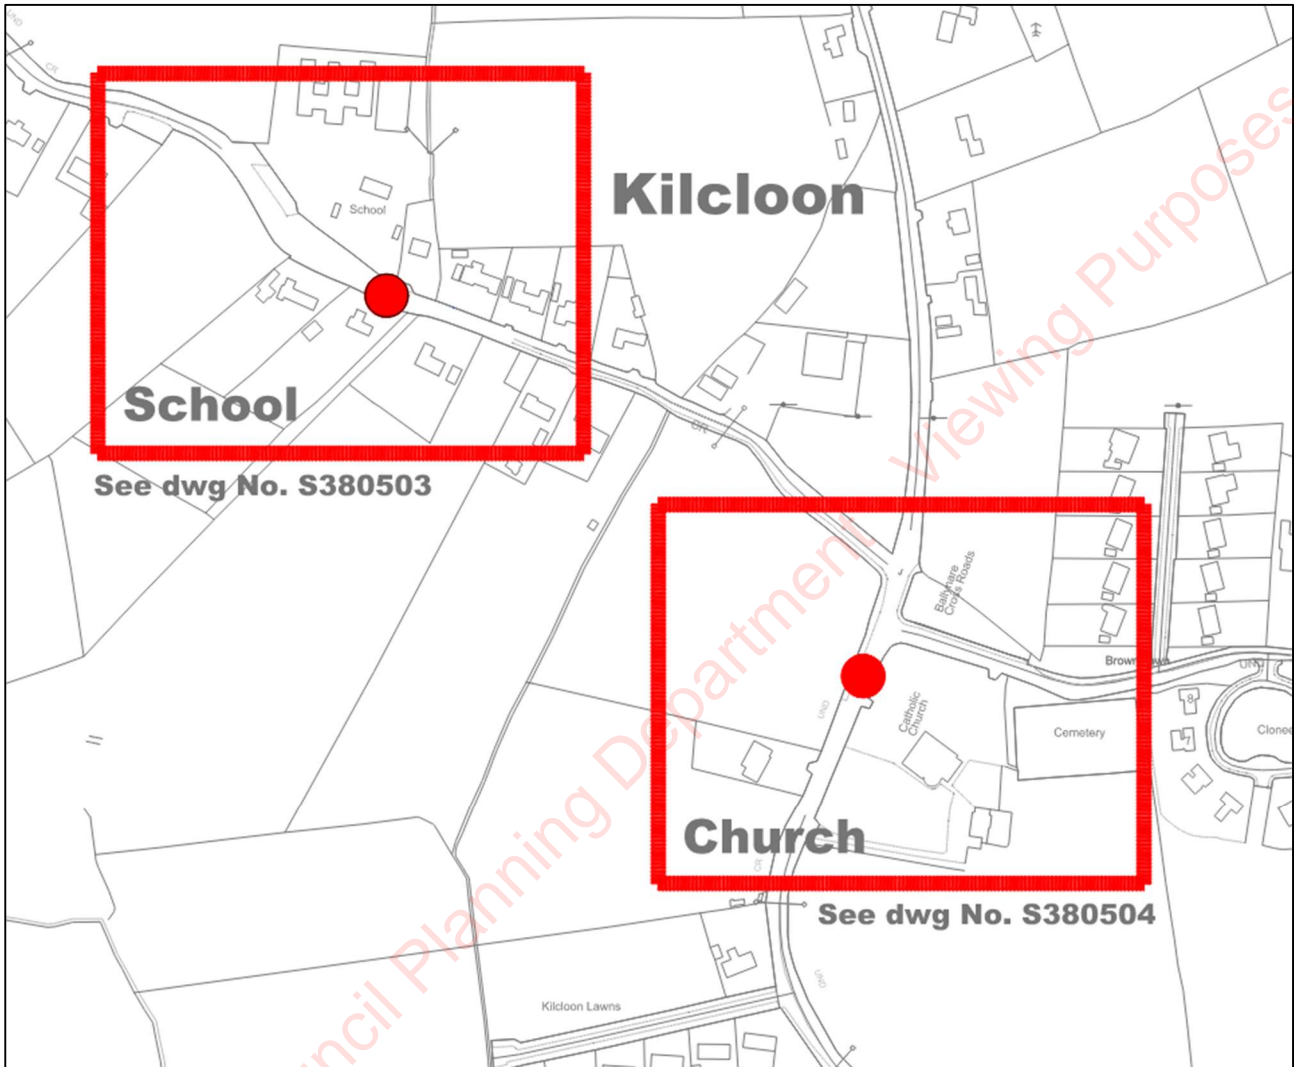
Proposed Site Location of Kilcloon Traffic Calming Scheme
